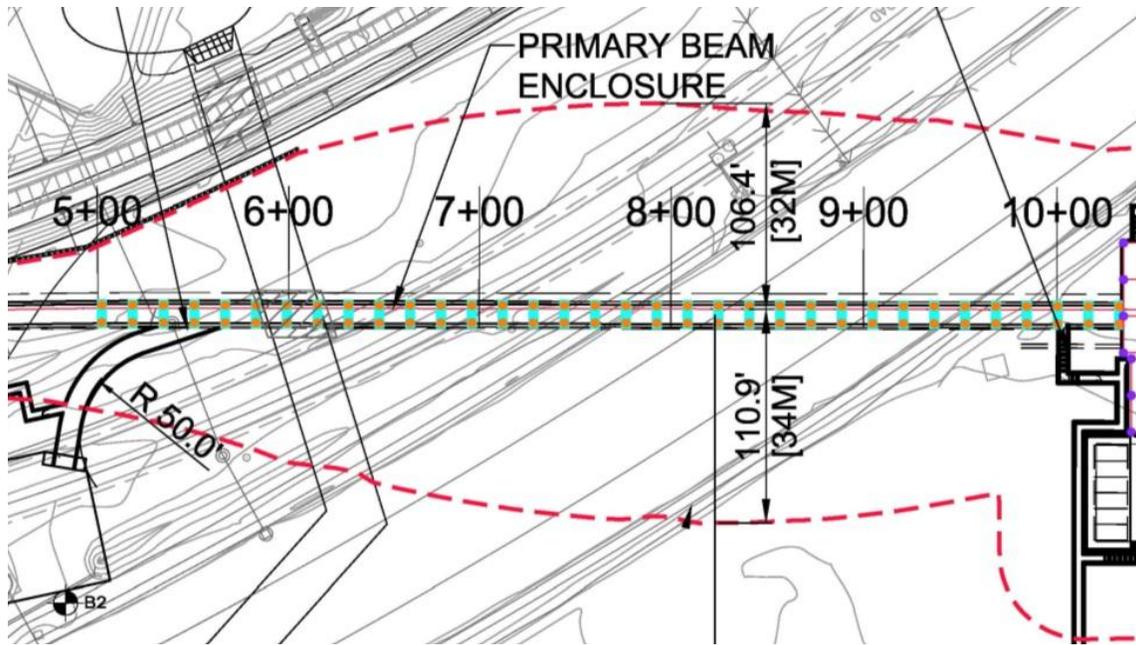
Drilled shaft pier cap locations for the Primary Beam Enclosure.
